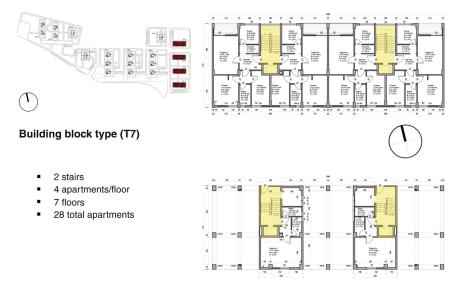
Ground and type floor of one of the four building blocks (T7). On the left, location of the double building block type in the urban setting of Peristeri.
